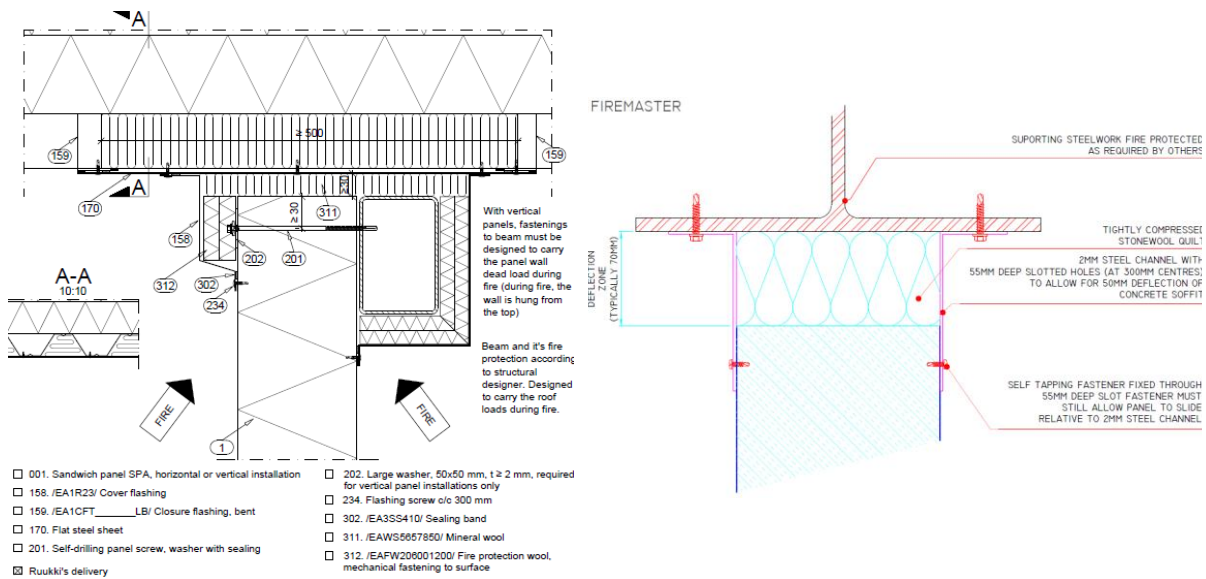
Detailing example at the wall/steel beam junction ([25], [26])
